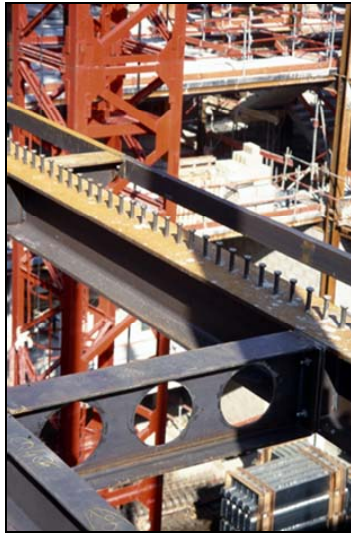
Composite beam with welded studs at construction stage
